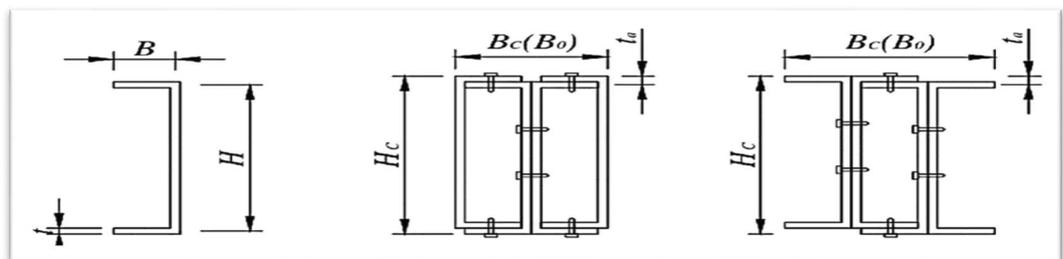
Cross-sections of the tested beams by Deng F (2022). ^[18]
